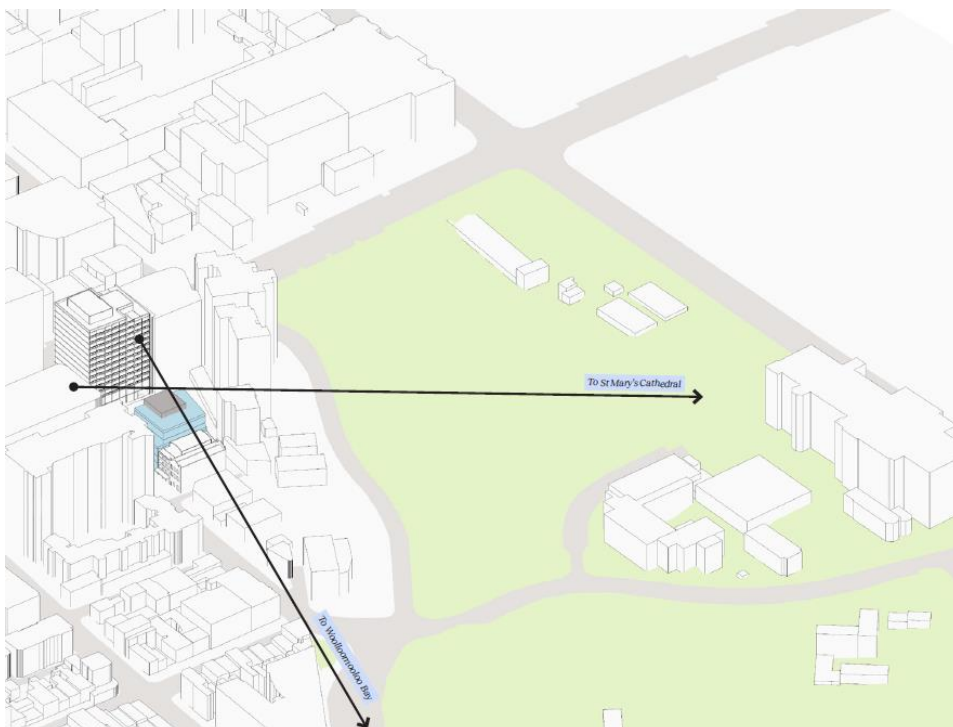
Views out from nearby buildings have been considered. There may be some impact on views and outlook from apartments at lower levels in nearby high-rise buildings, but the majority of apartments in these buildings will not have views or outlook adversely impacted.
